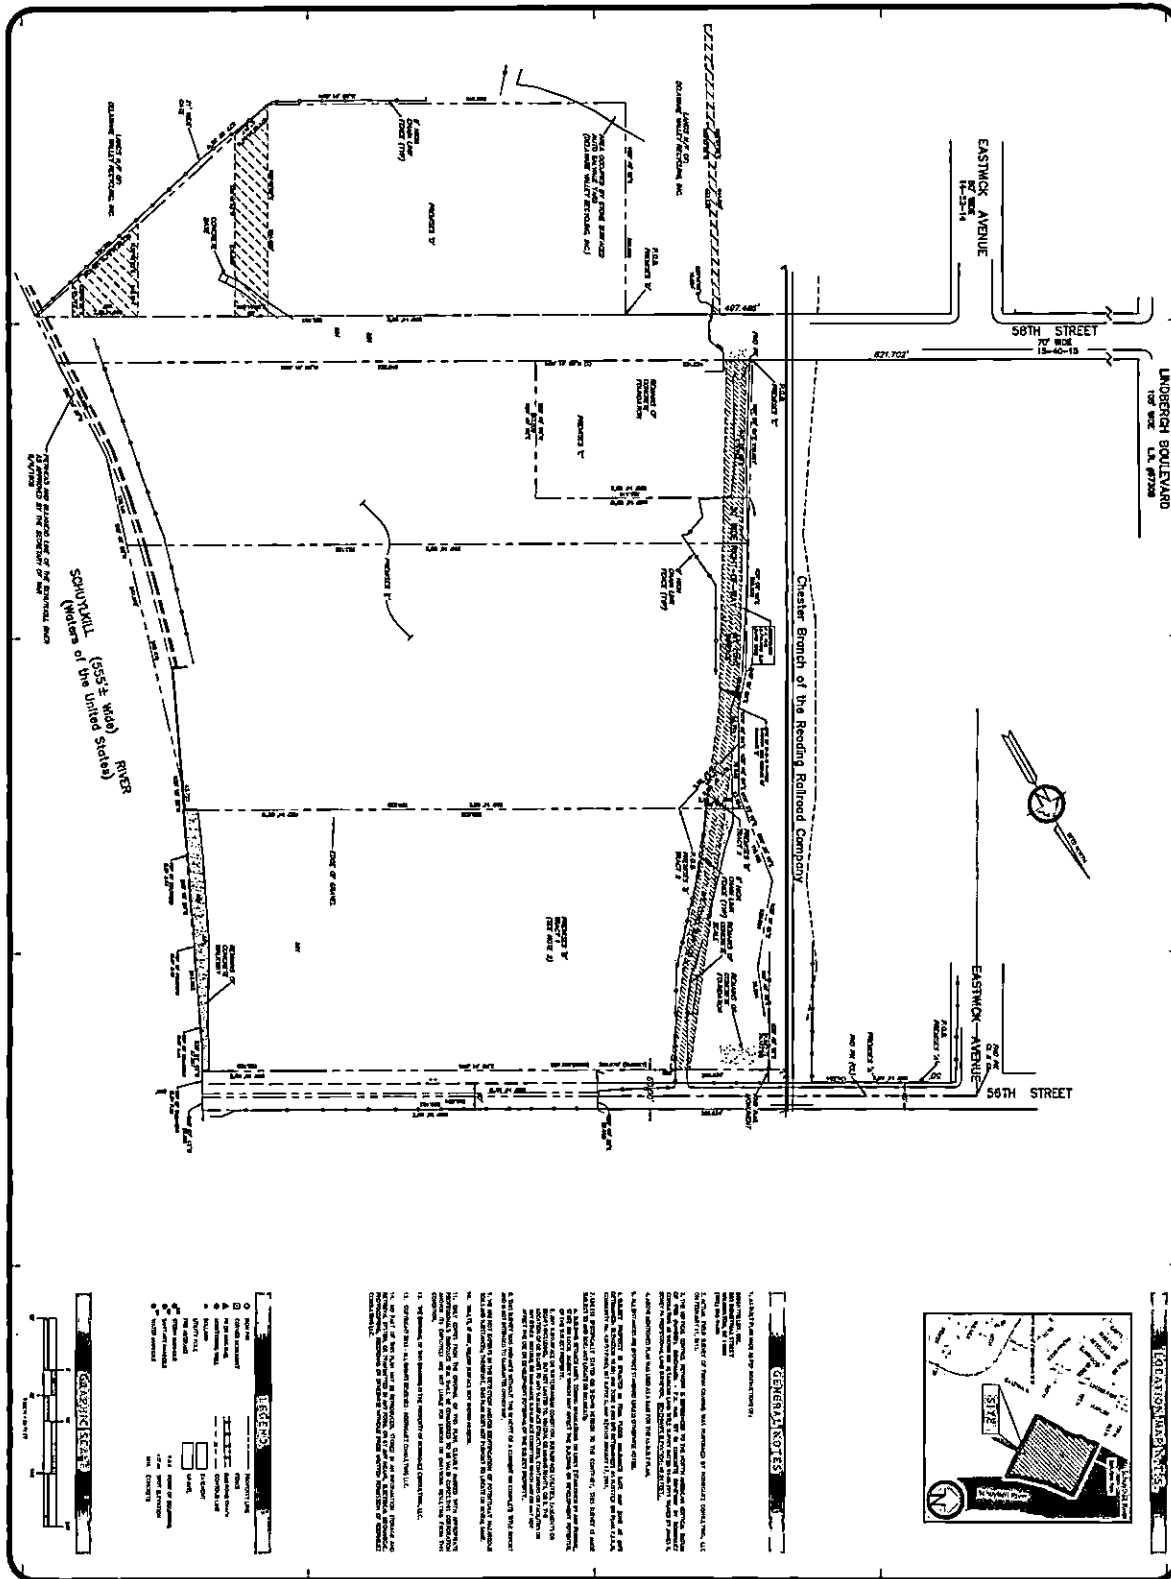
South 58th Street Philadelphia, PA FORMER TRANSMONTAIGNE SITE 58TH STREET & THE SCHUYLKILL RIVER PHILADELPHIA-PHILADELPHIA COUNTY-PENNSYLVANIA	DATE: 11/02/17 SCALE: 1"=100' PROJECT: ON	OWNER:	REVISION:	DESIGNED BY: R.D. DRAWN BY: MBE CHECKED BY:	FILE NAME:	DURFIELD ASSOCIATES 37 WEST 4TH STREET, SUITE 201 PHILADELPHIA, PA 19104 TEL: (215) 252-8754 FAX: (215) 252-8754 WWW.DURFIELDASSOCIATES.COM PHILADELPHIA-PA/PHILADELPHIA COUNTY, PA
